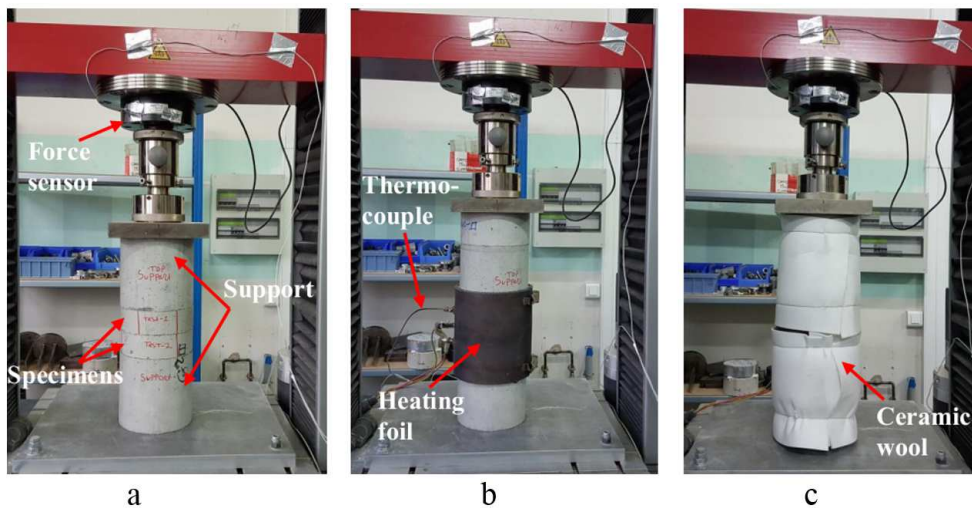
Sample preparation before preheating under uniaxial loading of the test specimens (a. specimen and concrete supports – b. specimen wrapped in the heating blanket – c. specimen with insulating wool).
